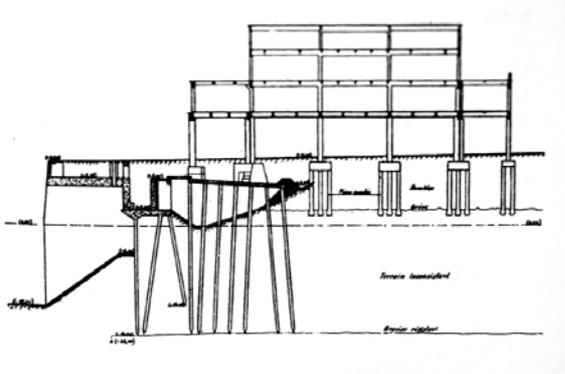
Cross-section through the Gare Transatlantique at Le Havre. (Grote and Marrey)
